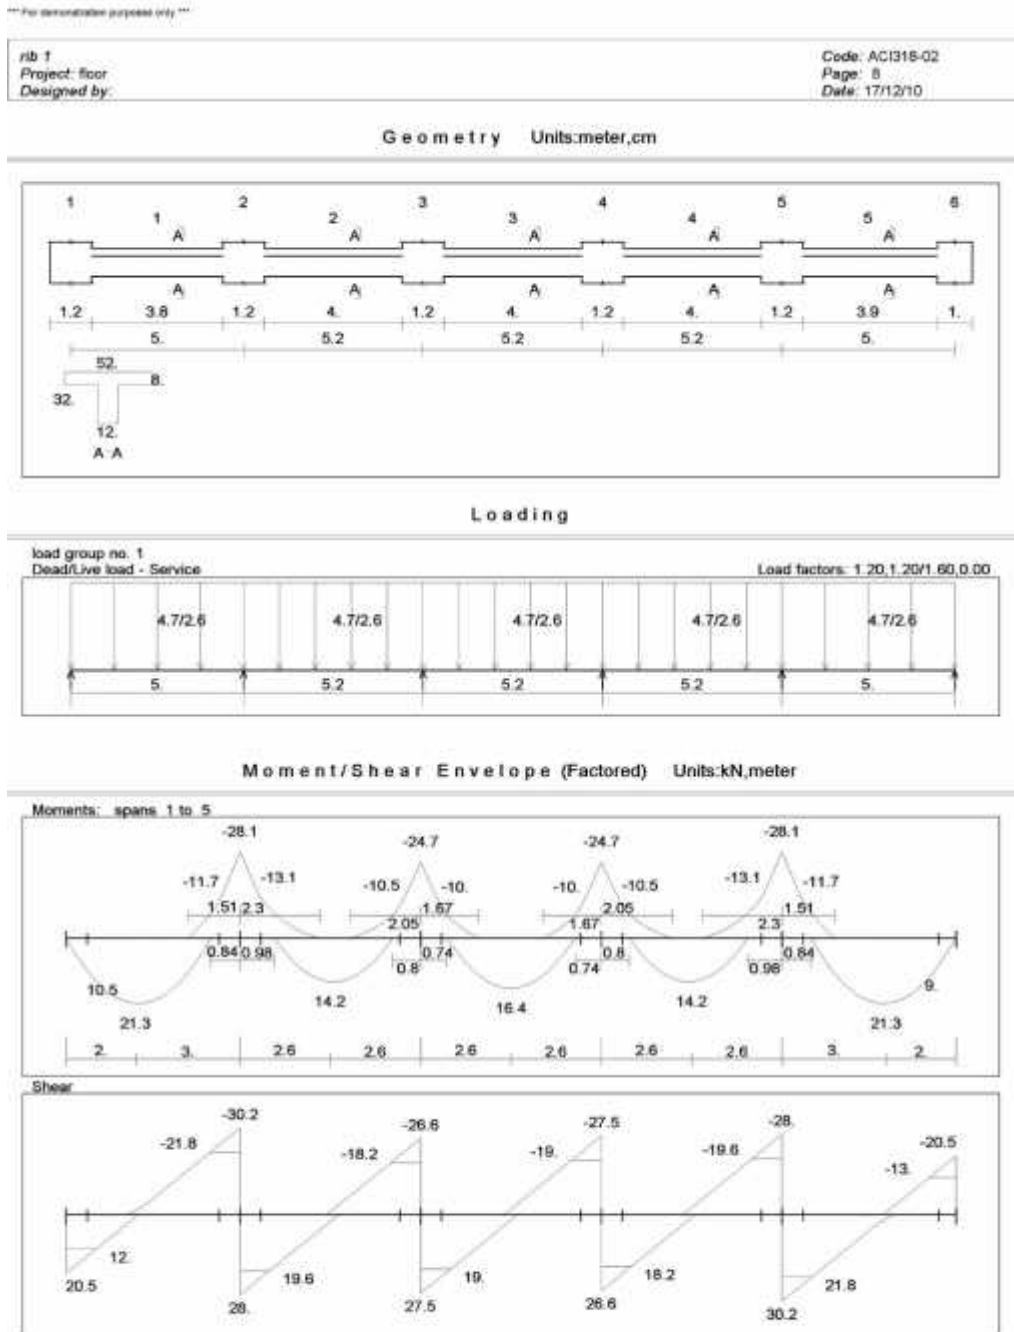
Geometry, Load & Shear/Moment Envelop of rib 1.
